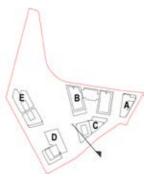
F1.11 Building C boundary condition & Key Plan The proposal seeks to maintain building separation for both privacy and acoustic purpose.
